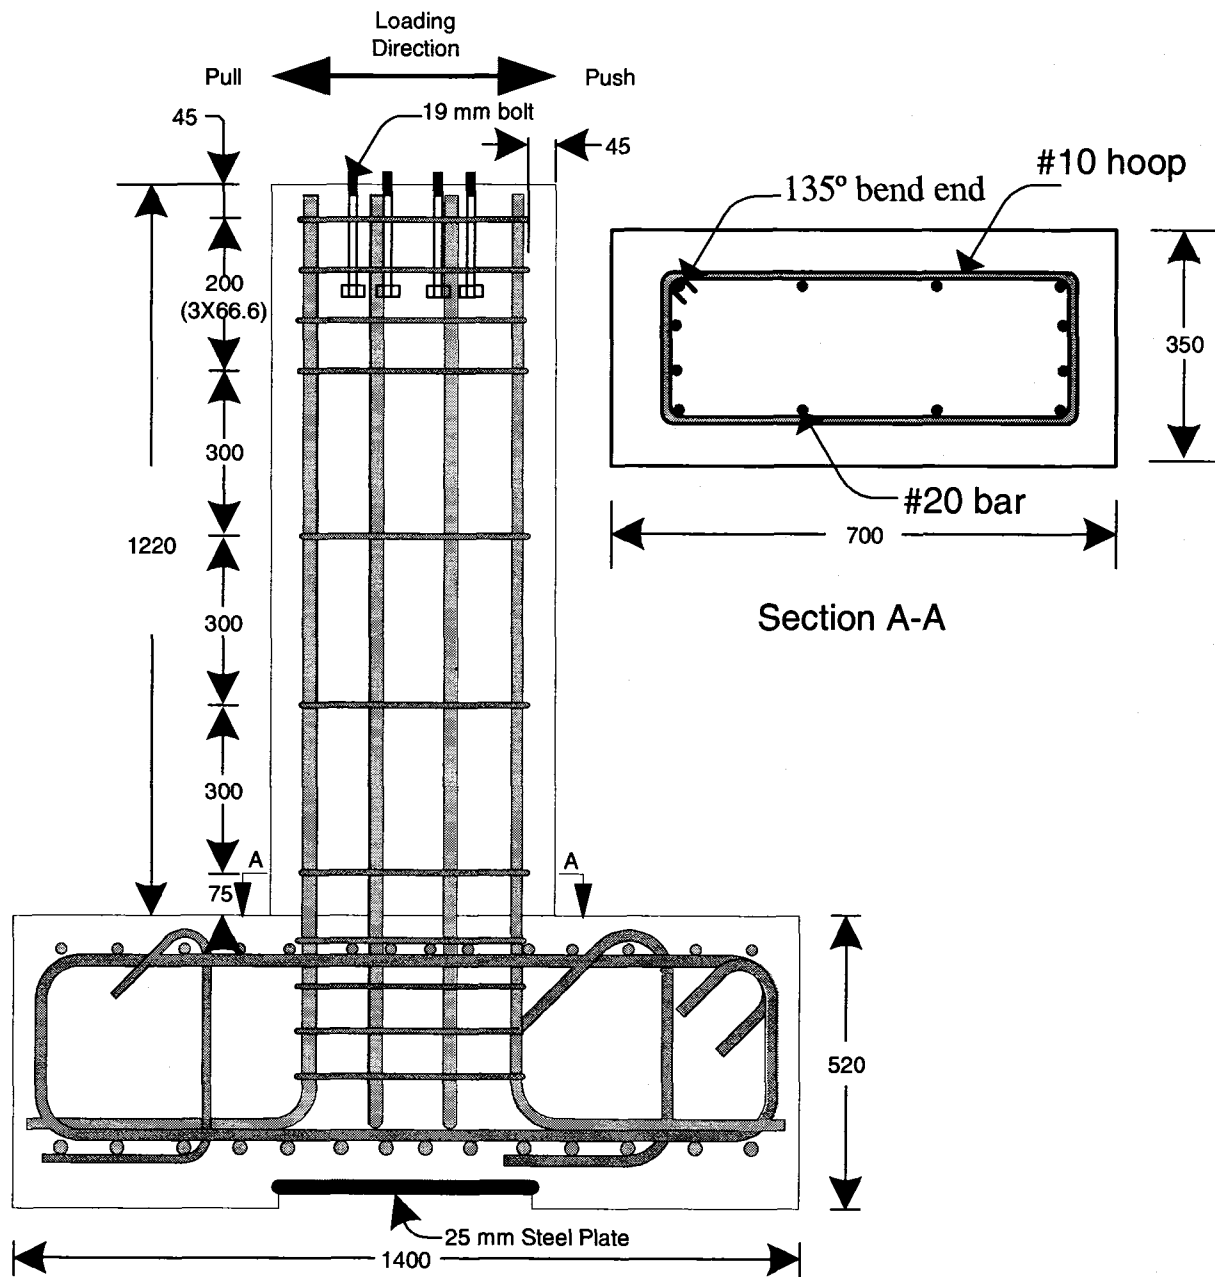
Geometry and reinforcement details for Columns SR-C and SR-R
